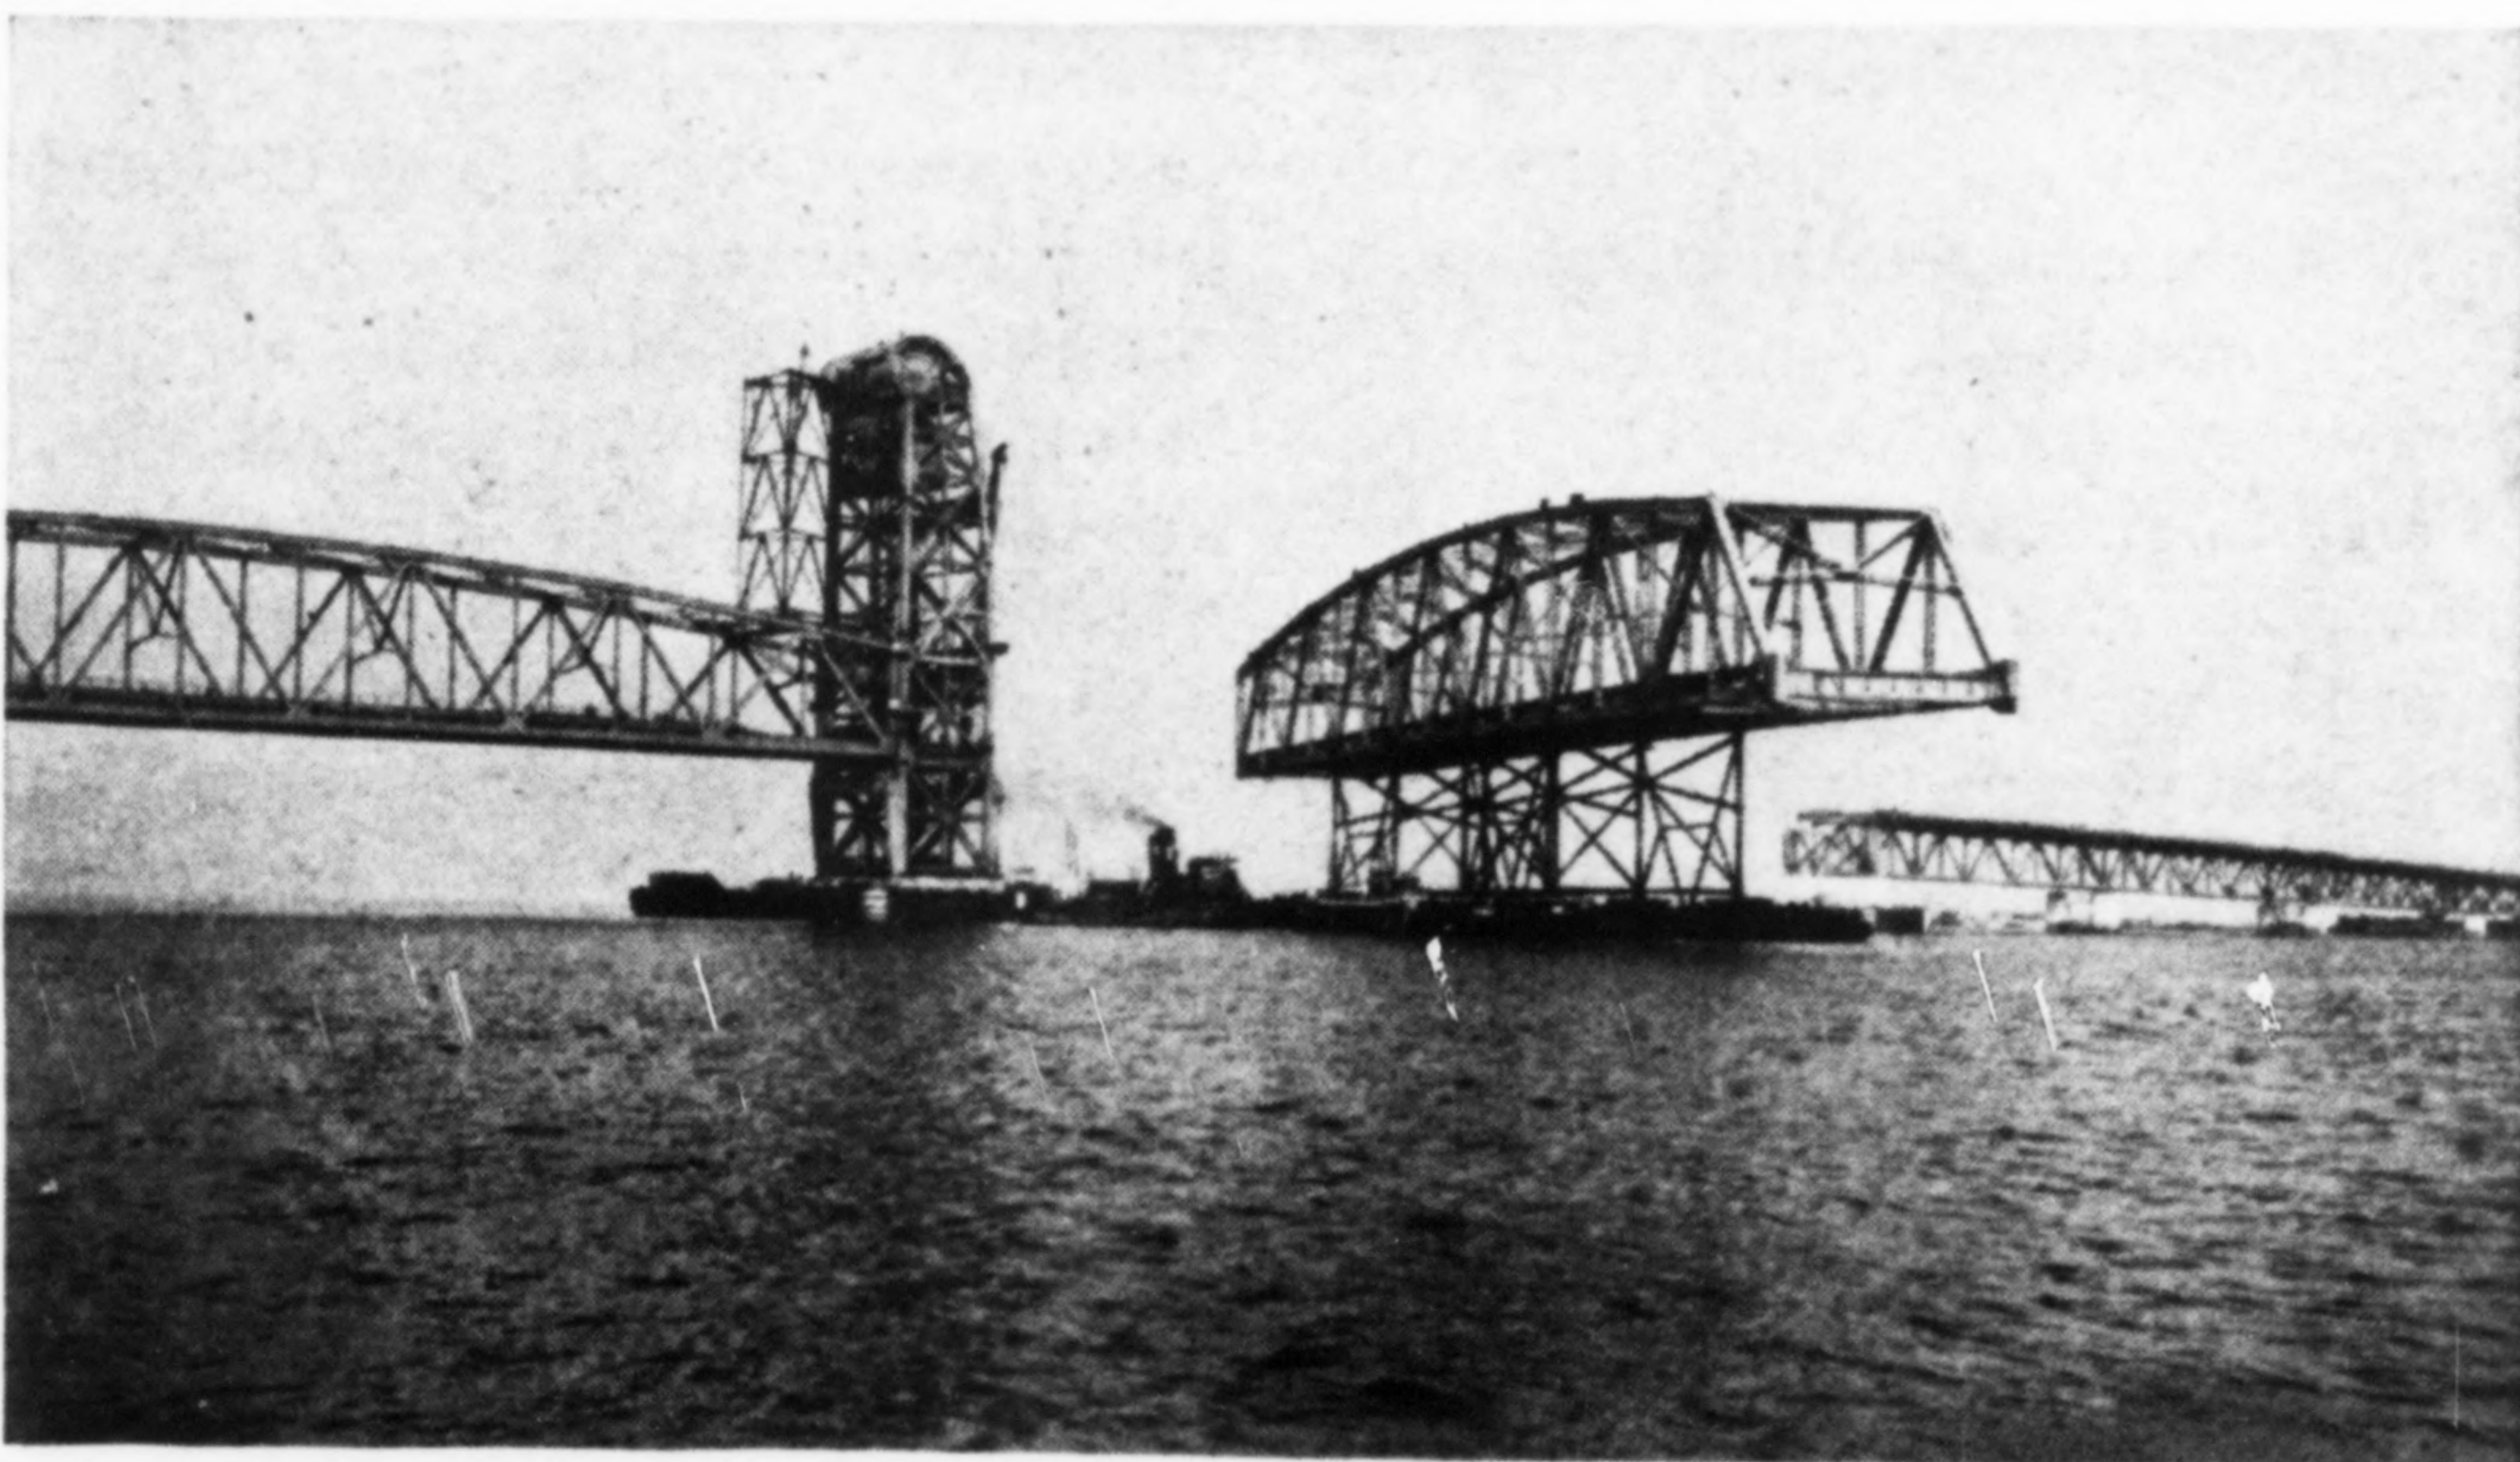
Masts and booms on the tower face were used to assemble the 540-ft. fixed spans that flank each end of the lift span.
